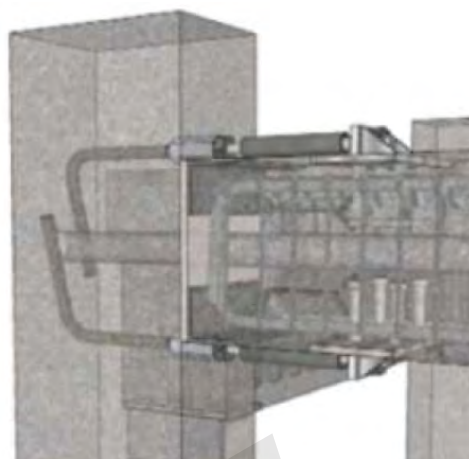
Connection at external column with central unbonded post-tensioning and top and bottom external replaceable "Plug and Play" dissipaters (modified after Johnson et al 2013).
